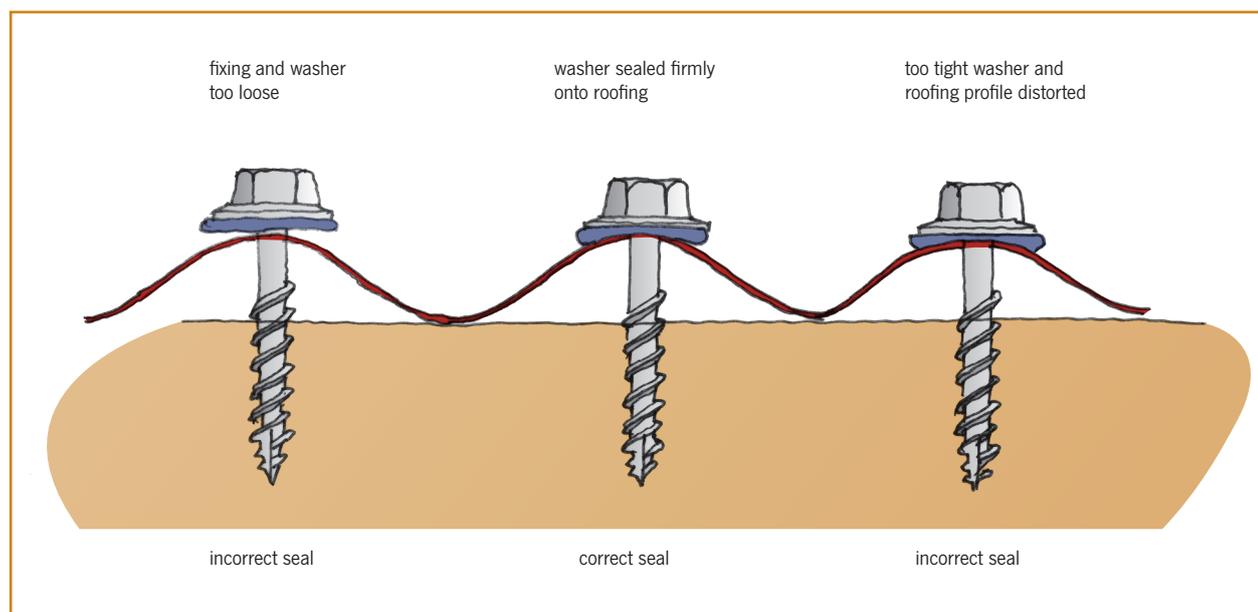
Installation of screws and sealing washers (roofing screws for fixing into steel purlins shown).
